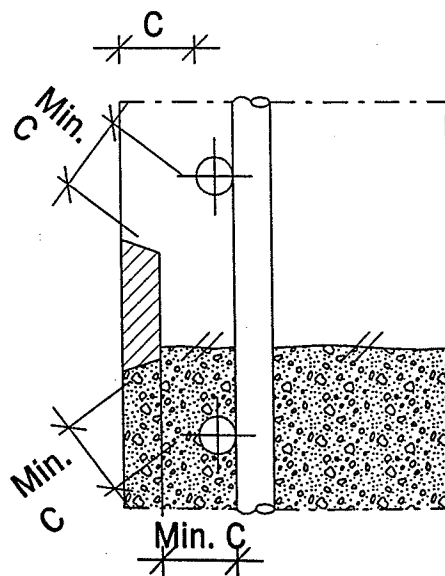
Structural design for trapezoidal groove.  $C$  = concrete cover.
